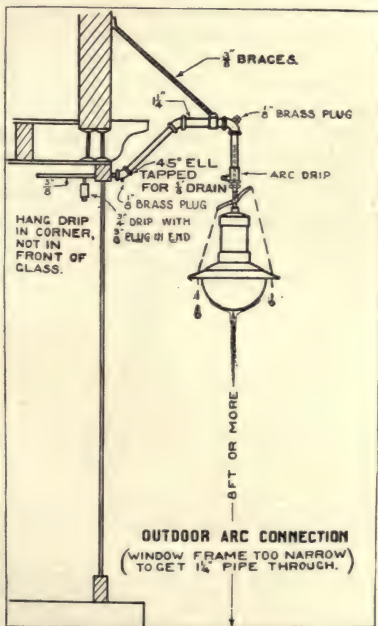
Outdoor Arc Lamp Connection, page 849.
